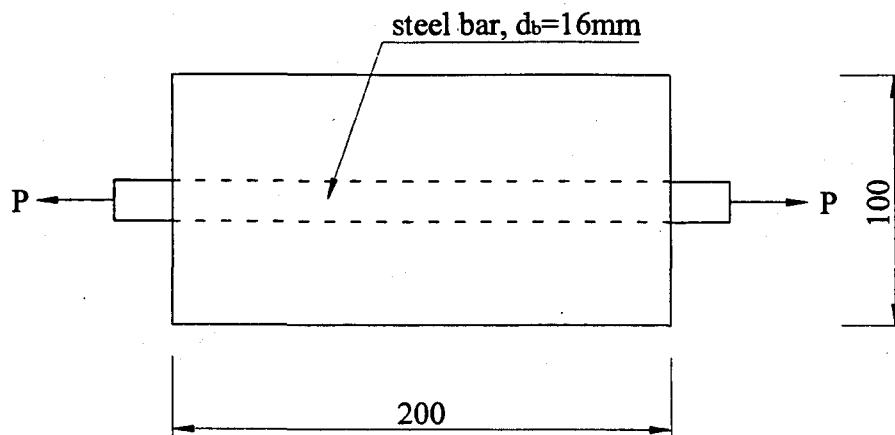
Dimensions of Tension Specimen (Specimen II)
